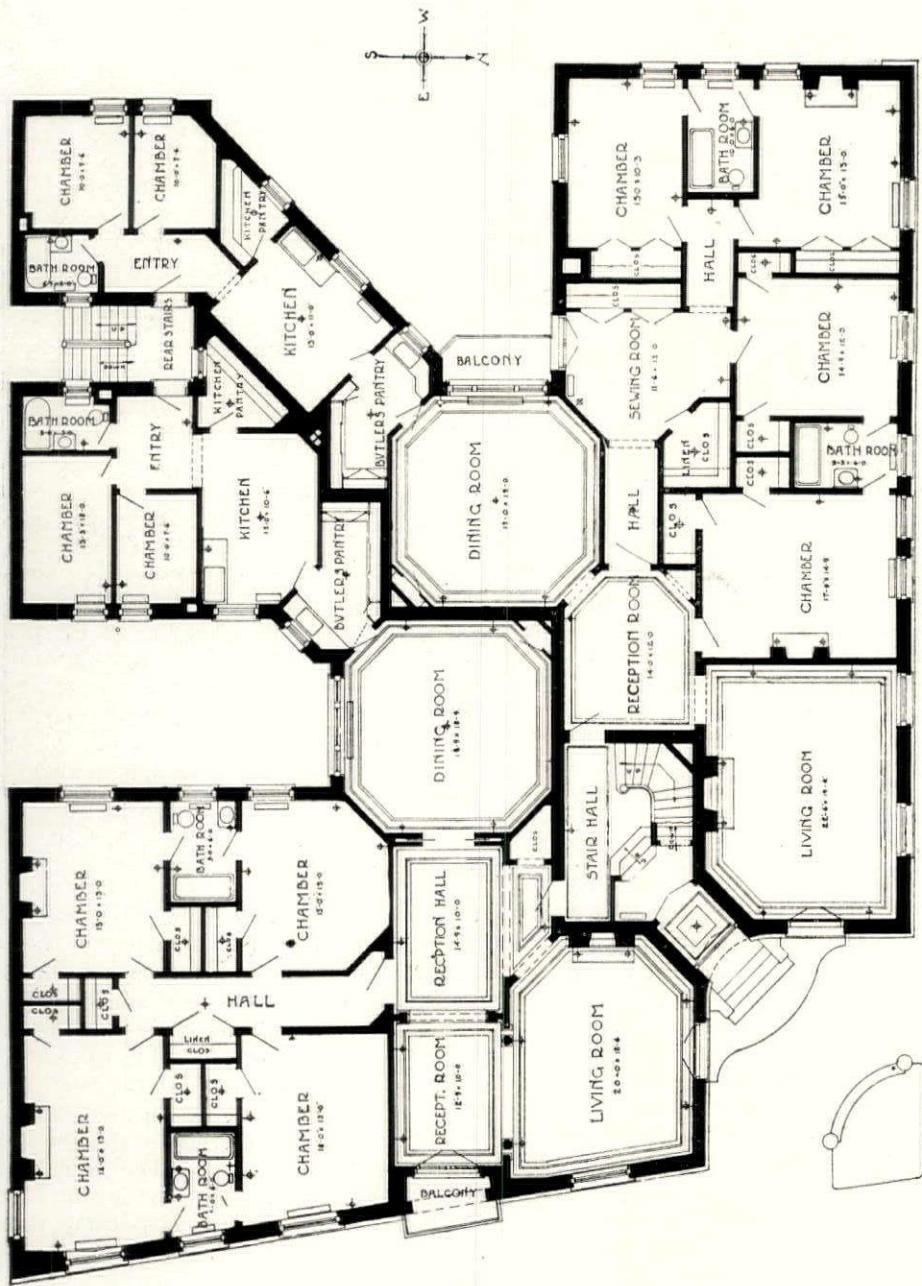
TYPICAL FLOOR PLAN—APARTMENTS AT NO. 1367 NORTH STATE STREET AND NO. 1362 ASTOR STREET, CHICAGO, ILL.
